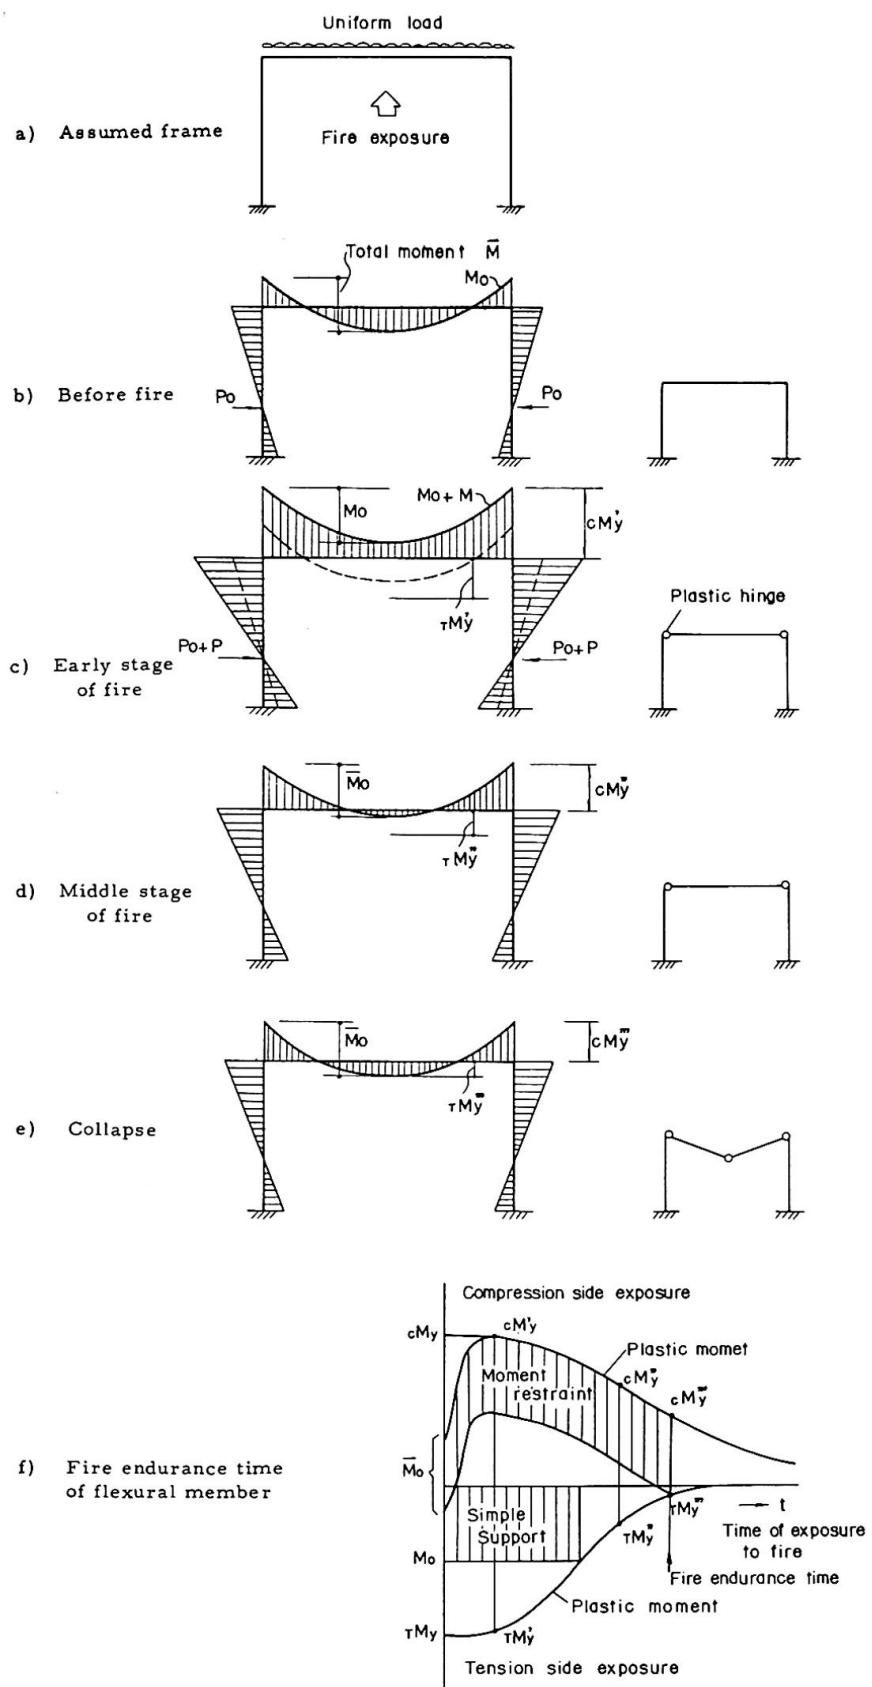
Redistribution of moment and mechanism of collapse in building fire
